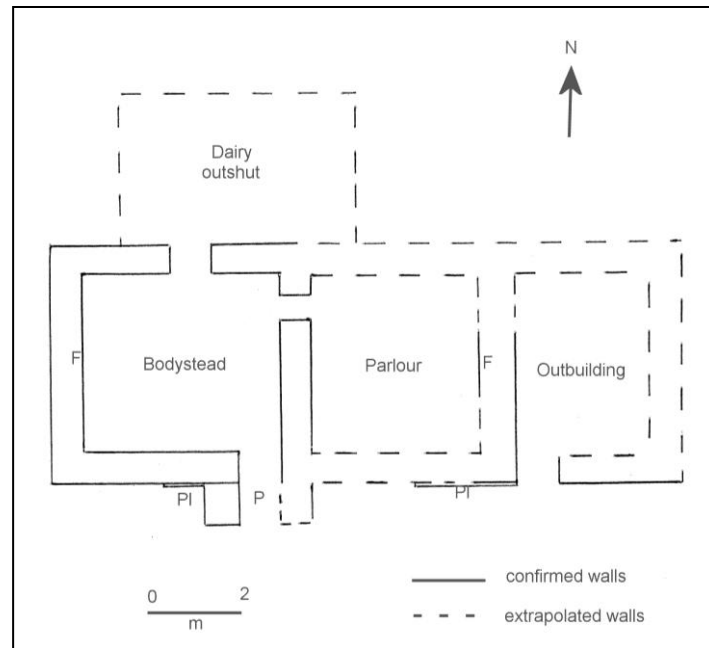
Final scale plan of Thorns 3, a direct entry plan house with gable stacks and added rear dairy
